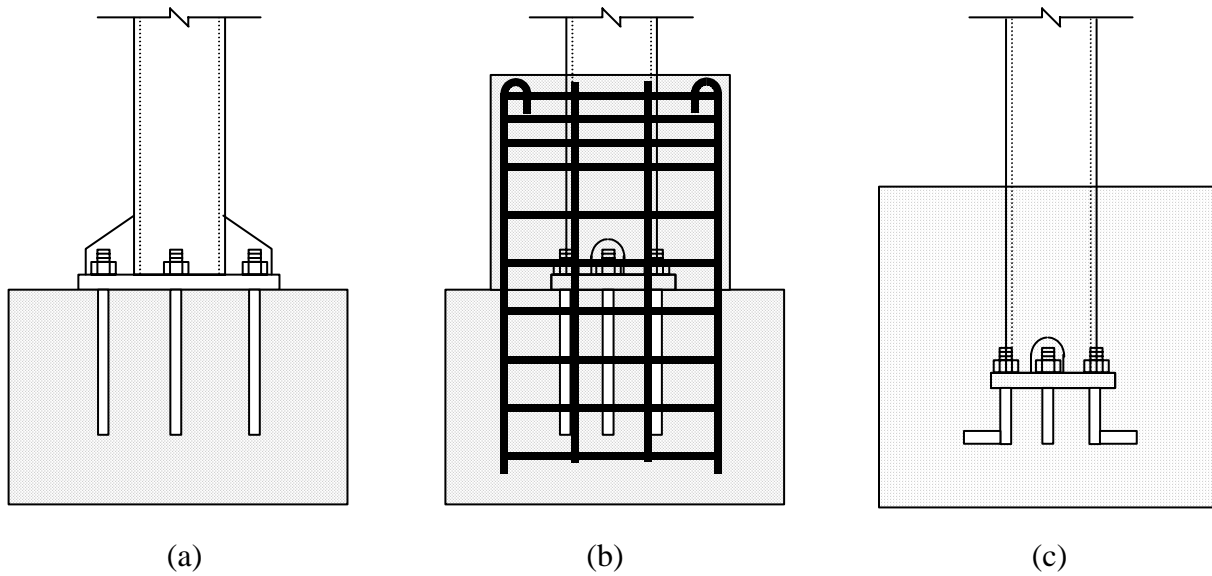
Types of Column Bases Popular in Japan; (a) Base Plate Connection; (b) Concrete Encased Column Base; (c) Embedded Column Base
